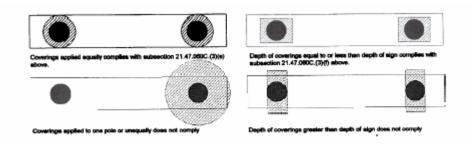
Examples of pole wrap. Poles depicted in plan view.
